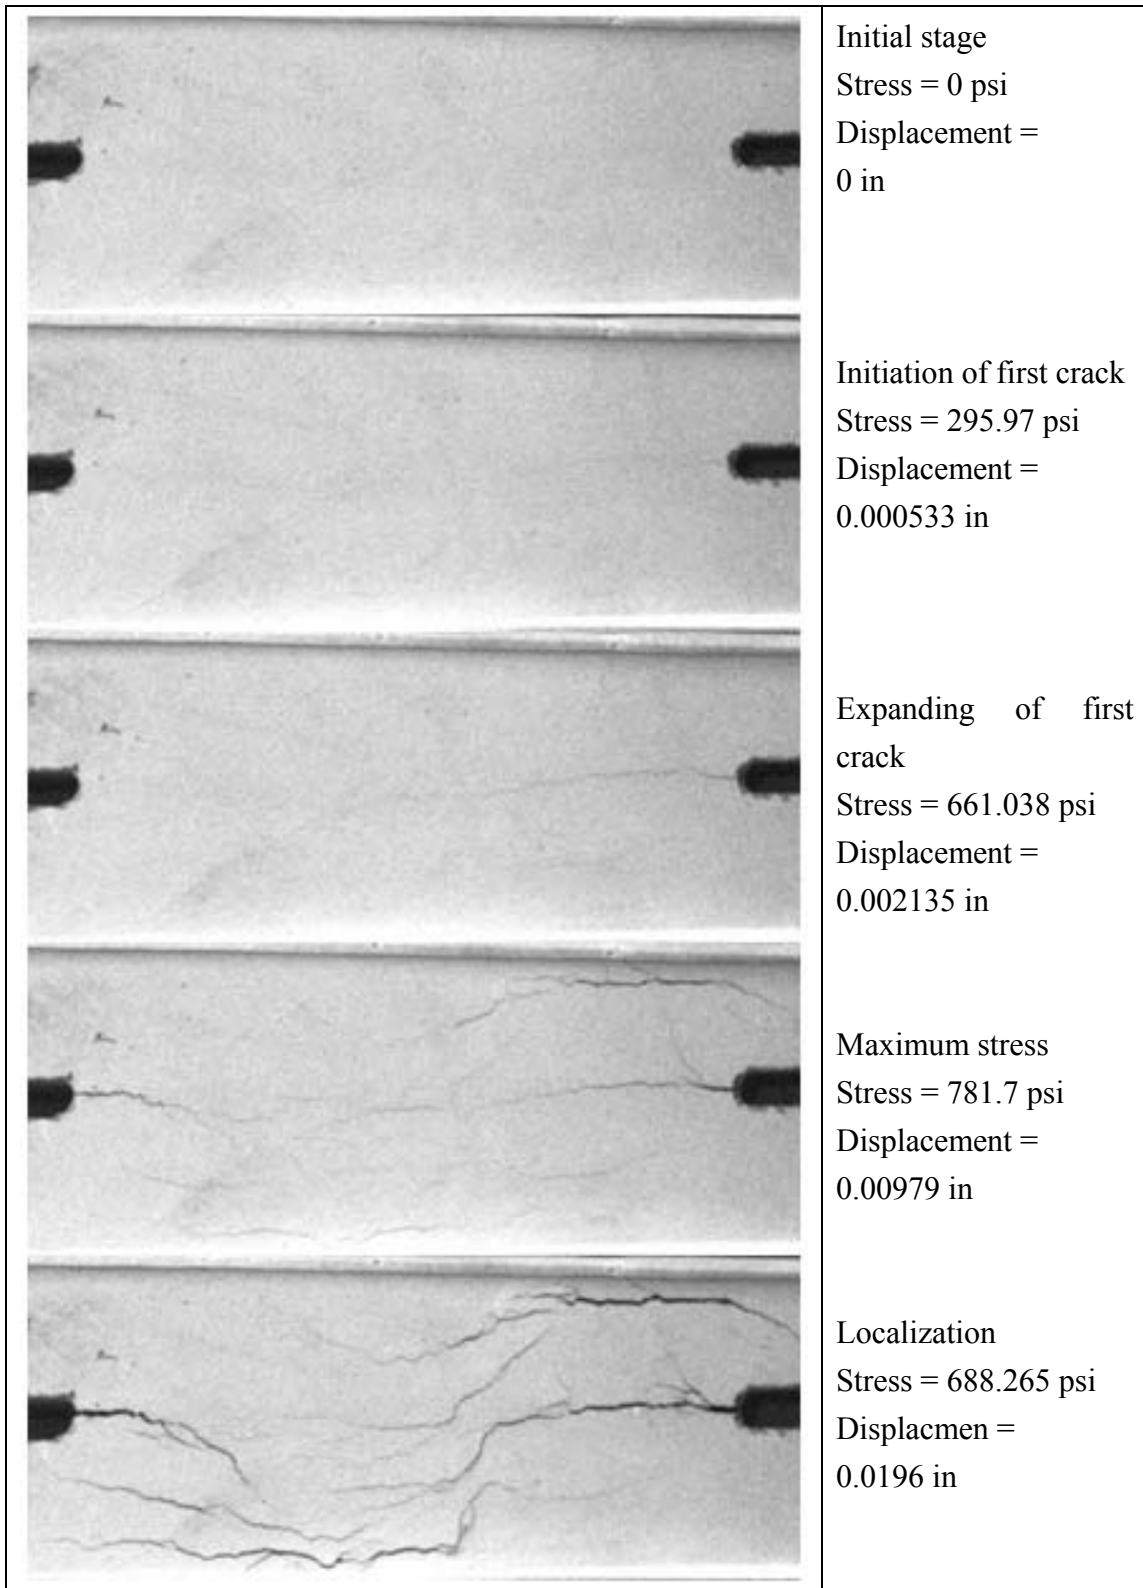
Crack formation under increasing load in test series reinforced with 0.75% Torex steel fiber (Notch test)
